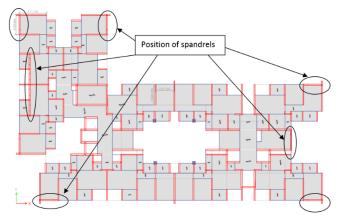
Model C: Part of building plan with seismic joint and spandrels
